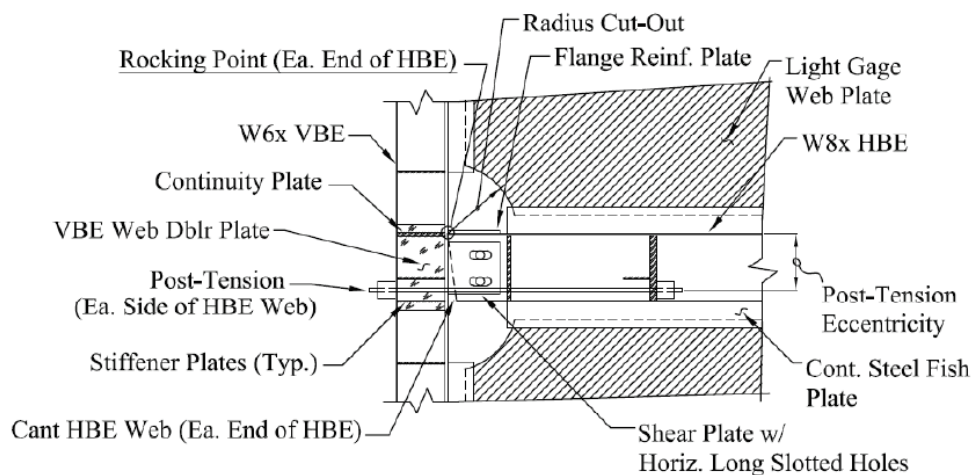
Configuration of the PTSC connection proposed by Dowden et al. (2011).
